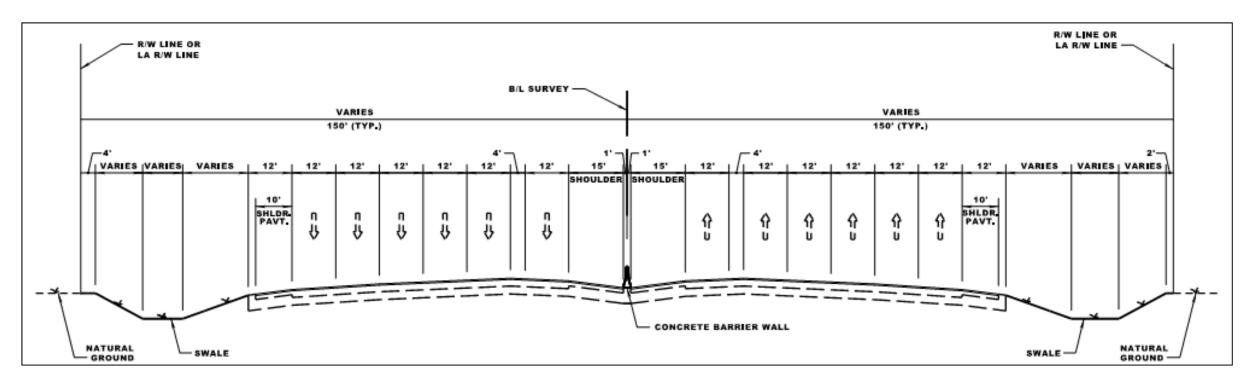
Existing Typical Section along SR-9/I-95 Mainline
